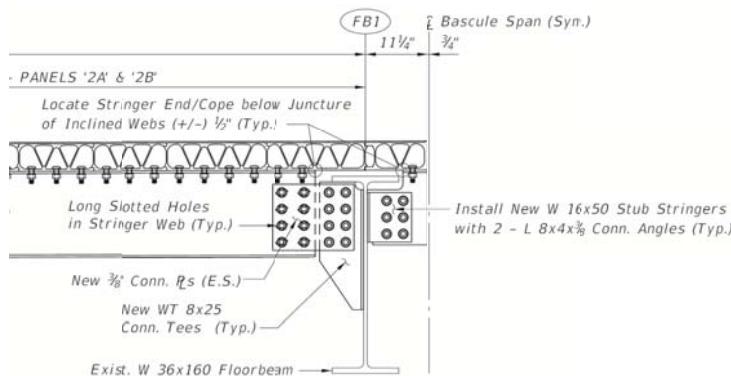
Typical Bascule Bridge Partial Longitudinal Section at End Floorbeam
